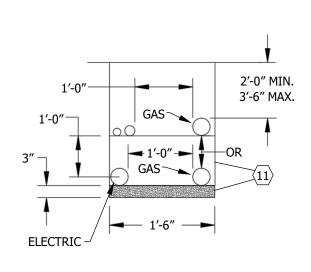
TYPICAL RISER PLACEMENT SEE TABLE 1
